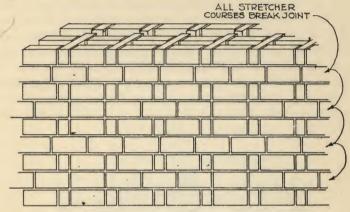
Unexposed side 12½ in. ideal all-rolok wall.
